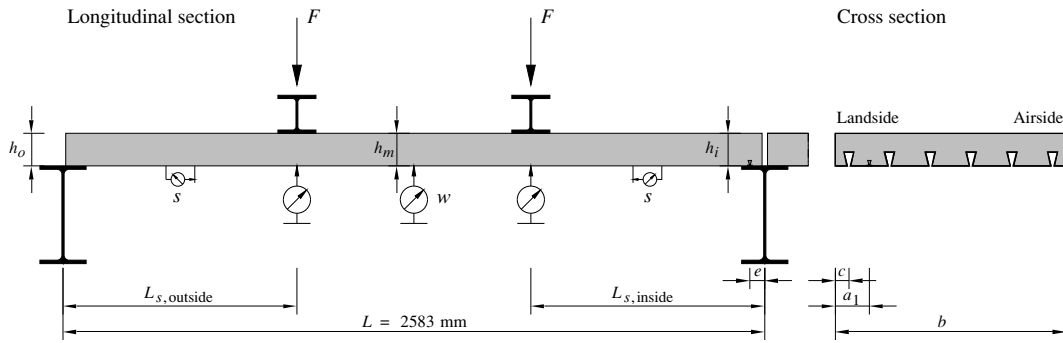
Longitudinal section (left) and cross section (right) of the test specimens.
